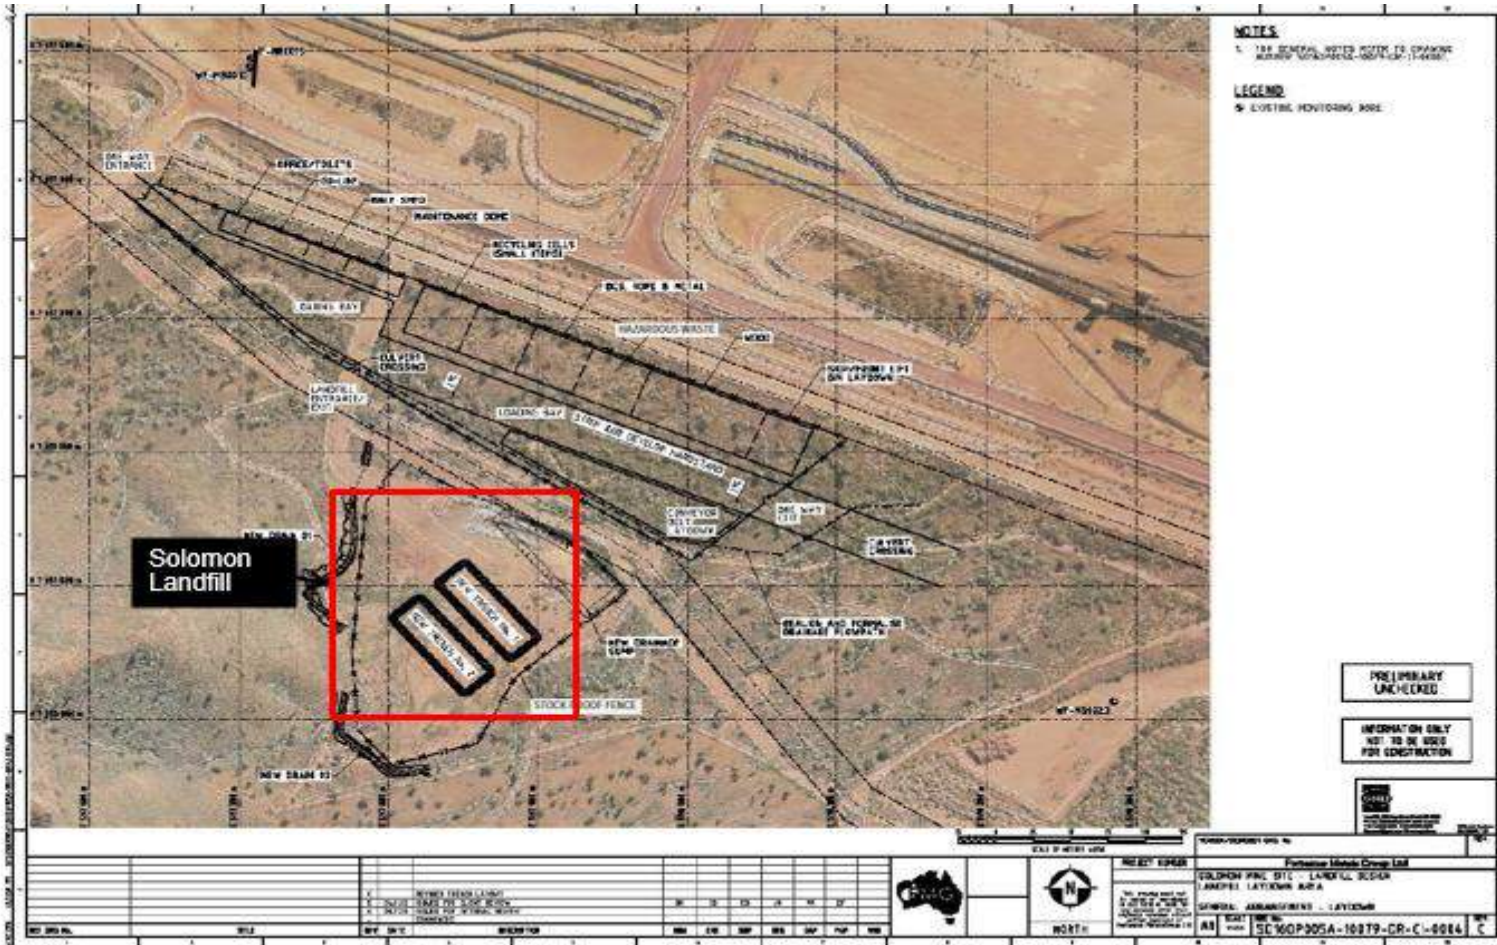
The used tyre and other waste rubber disposal sites as per Condition 4, Table 3. Firetail North Waste Dump and Firetail Waste Wood Disposal Area are for the disposal of untreated timber.
